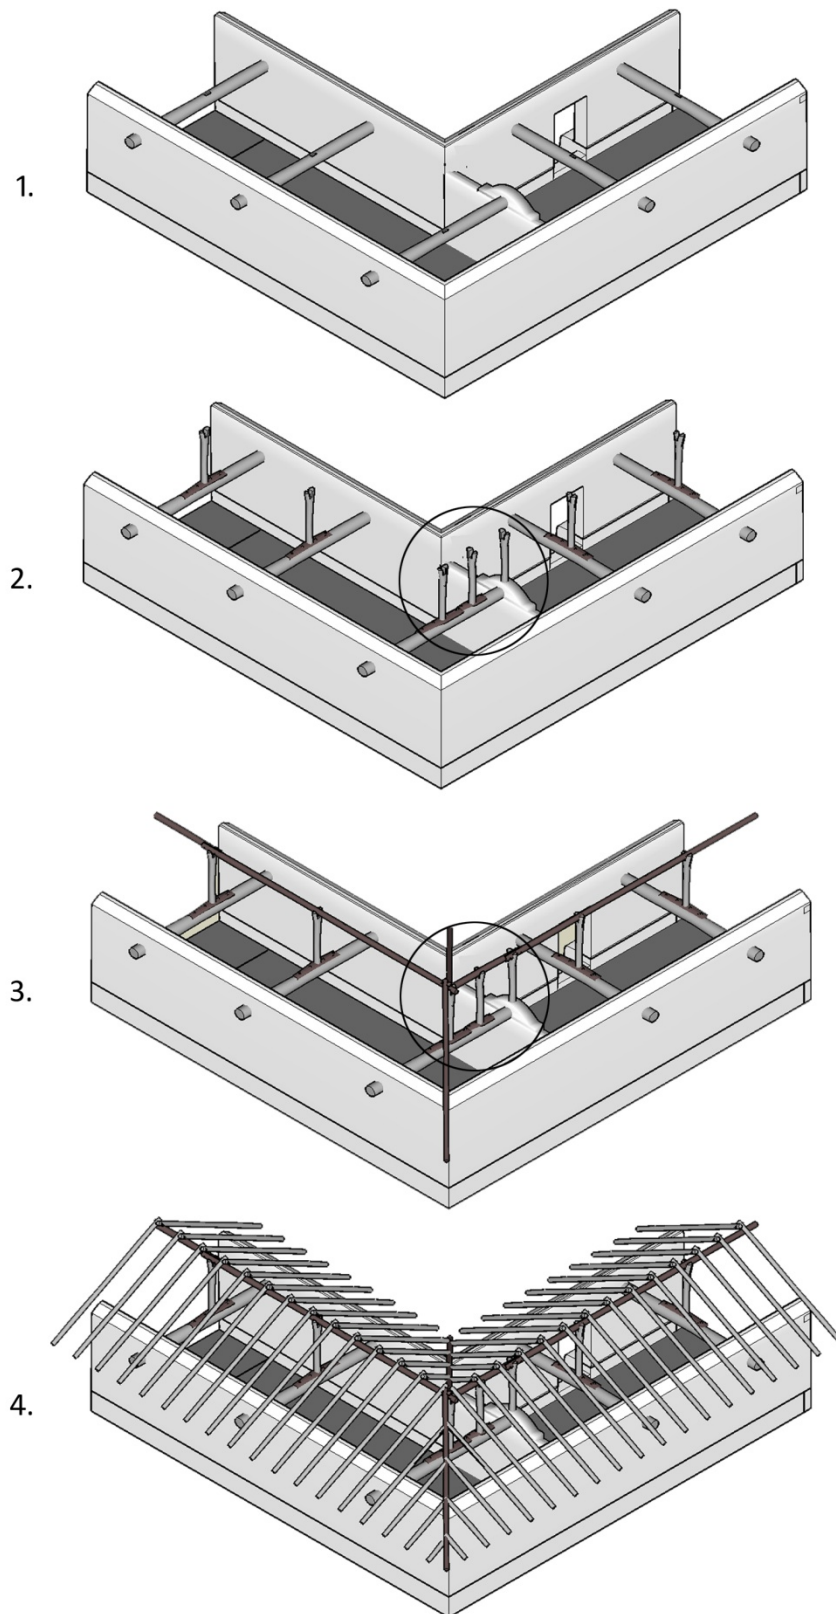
L-shaped roof junction with perpendicular ridge beam. Note the two posts (supporting the perpendicular ridge beams) supported on the same beam.
